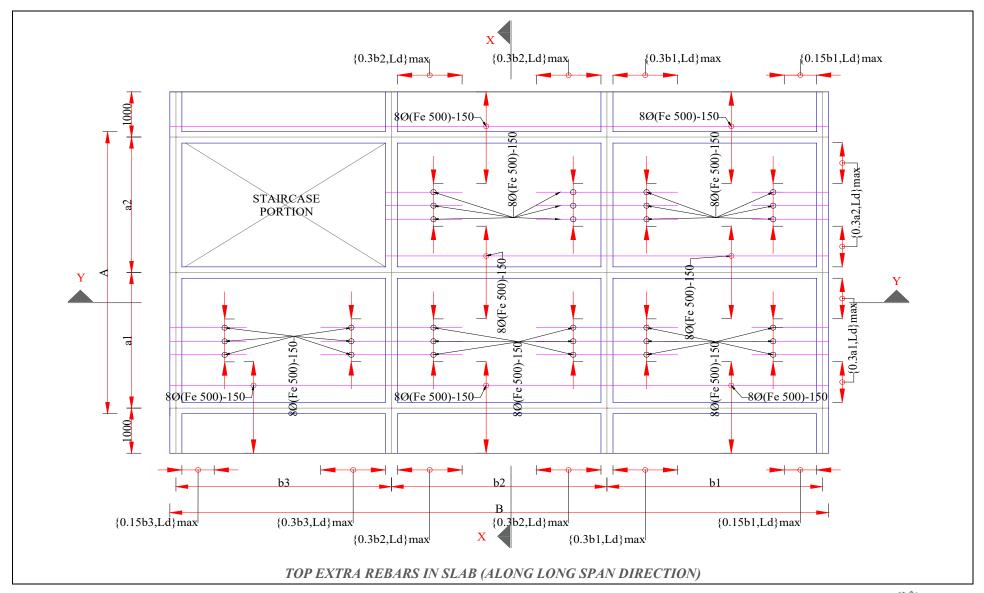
TYPCIAL FLOOR SLAB DETAIL (OPTION II)
